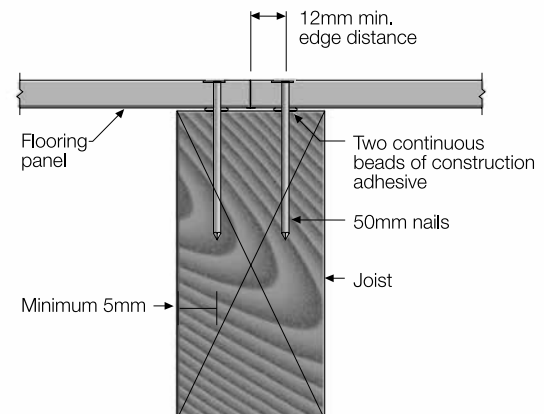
Butt joint internal dry/wet areas - vinyl floor
